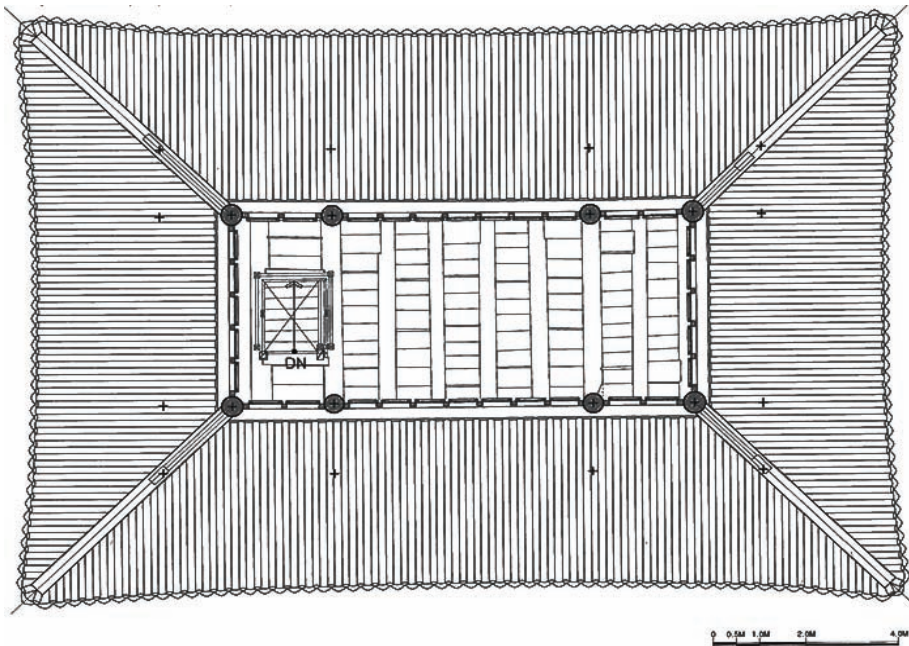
Floor plan documentation for Pungnammun Gate's Upper Floor. +: Location of Pillar.
